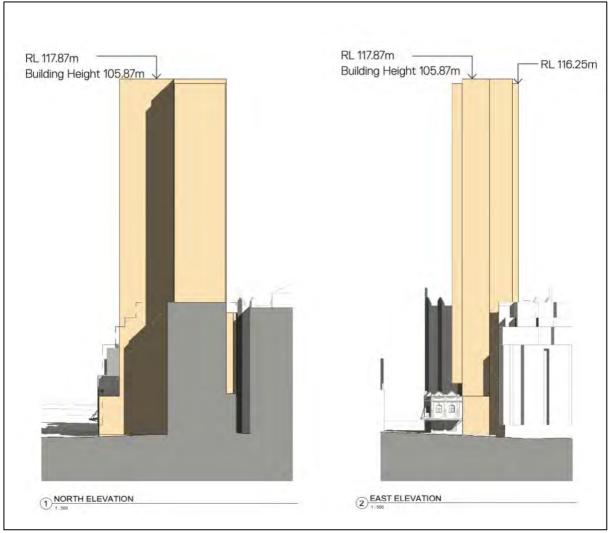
X North and East DCP Envelope Elevations (Source: Grimshaw October 2021)
